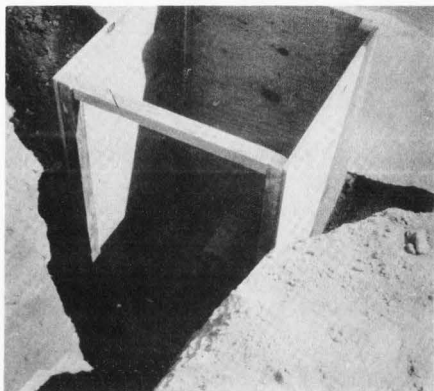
Detail of inspection box showing drain tile and excavation for sealed outlet tile (lower portion of picture).
